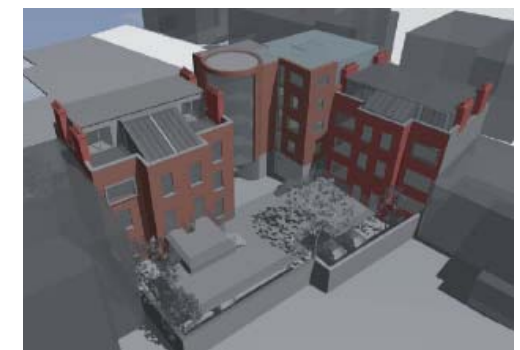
Above is a series of design studies for a group of existing buildings, including protected structures (of which the corner building was badly fire damaged). These explore the retention and adaptation of all existing buildings as one option, with additional roof top story and, as a second option, the replacement of an existing pair of unprotected, derelict, buildings with a new 7 storey residential buildings. What is relevant, is that the higher building is located on a secondary street, away from the most sensitive main street. This higher structure also contains a single large apartment at each floor level, giving triple aspect living accommodation. The principle here was that the higher building would also be of higher quality and is located in a less sensitive location. The rear yard area was designed to accommodate a small amount of surface parking at ground level, with a raised terrace above, providing open space with southerly aspect, for the upper level apartments (most had their own balconies also). Ground floor is retail use (office use for the off-main street higher building).
